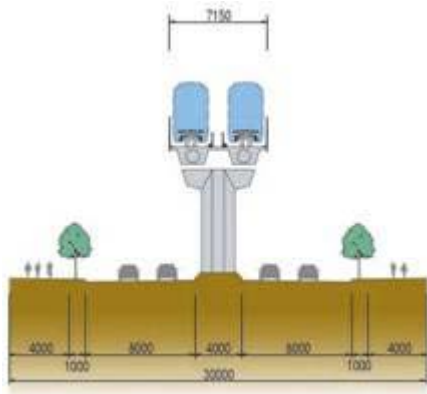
Cross-section view of T-shape bridge pier structure
